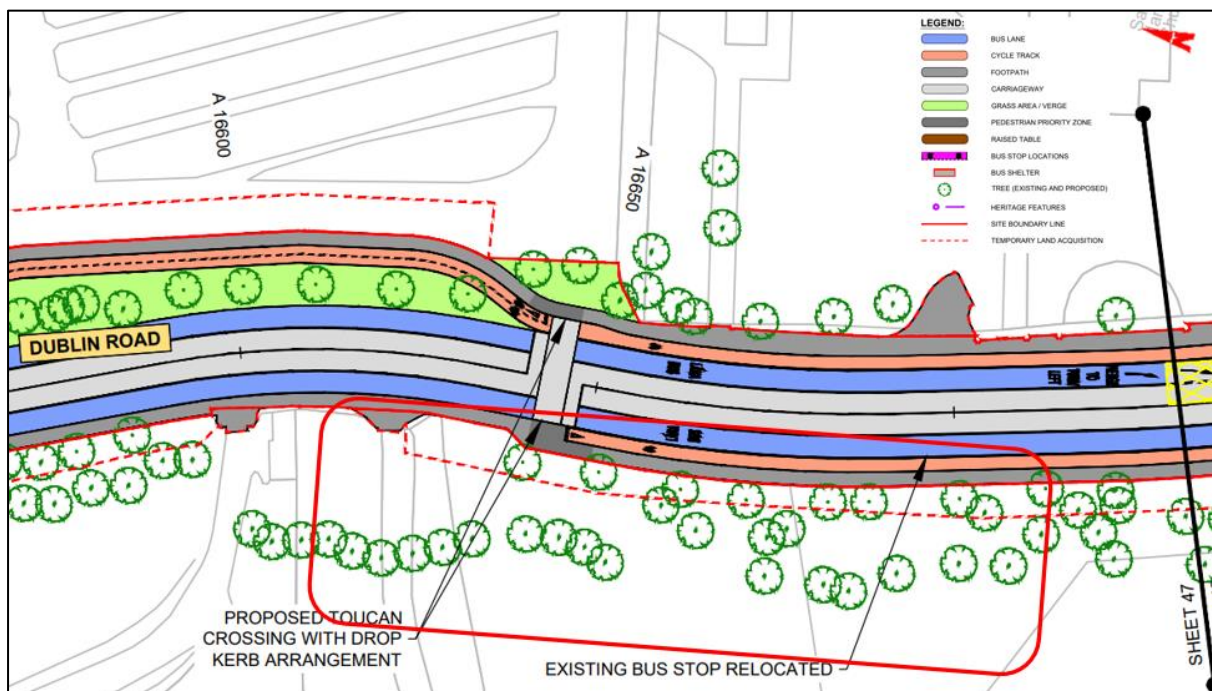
Extract from General Arrangement Drawing at Beauchamp House (Sheet 47)
